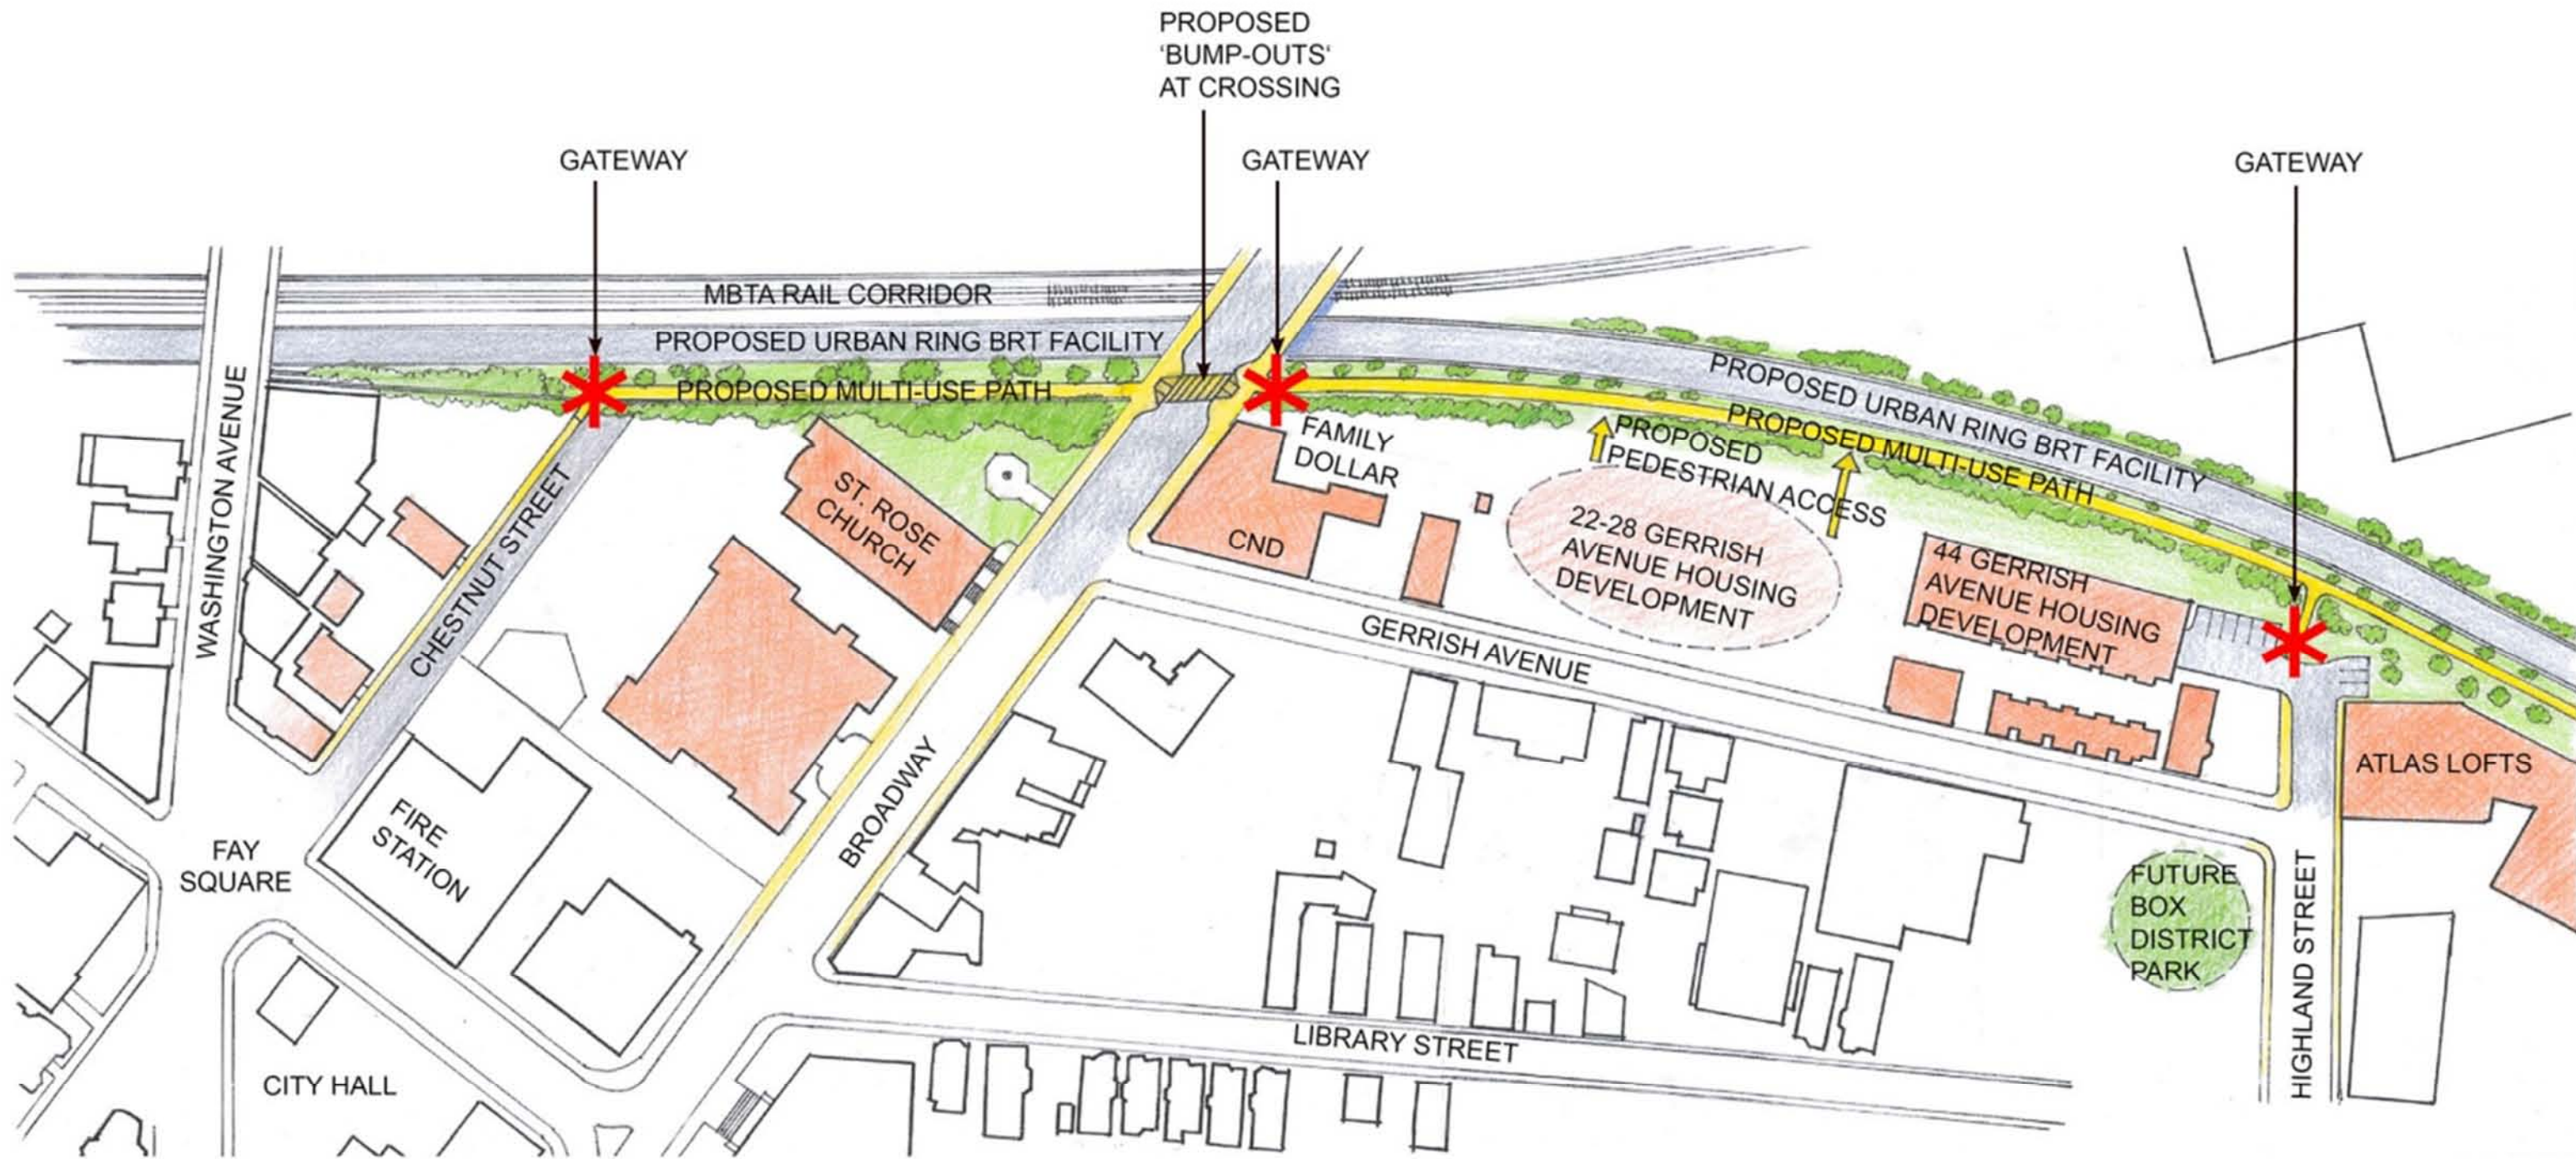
Segment 2 –Plan View from Highland Street to Chestnut Street
